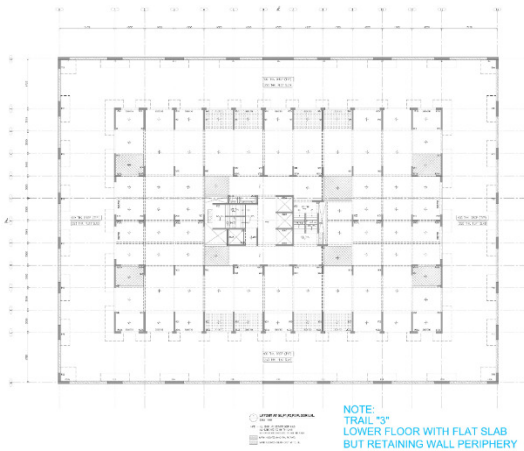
Lower floor with flat slab but retaining wall periphery (Trail:03)
